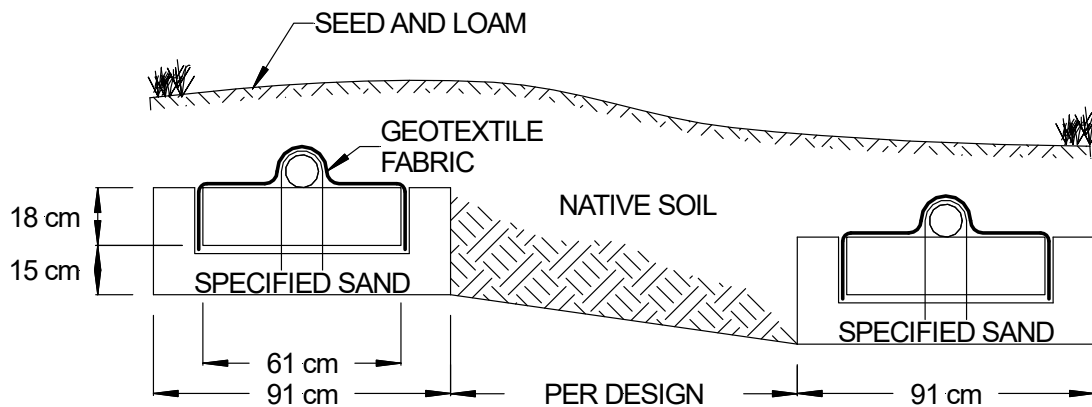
SECTION VIEW – TRENCH SYSTEM – SLOPING SITE
